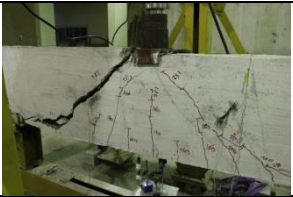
shows the crack pattern at failure for the tested specimens. For all specimens, first crack was flexural crack at the mid span region. With further load increase, diagonal cracks initiated and extended toward the supports and the beam compression zone. Consequently, with further load increase, the diagonal cracks width and the cracks intensity increased. At the ultimate load, beams failed with different failure modes. The failure modes of all test specimens are also included in figure 4. Failure modes of the tested specimens varied between diagonal splitting (the splitting plan connecting the inner side of the loading plate with the inner side of the support plate), diagonal crushing, and diagonal crushing combined with upper node crushing, diagonal splitting with crushing of upper node, and bearing failure under the loading plate.
